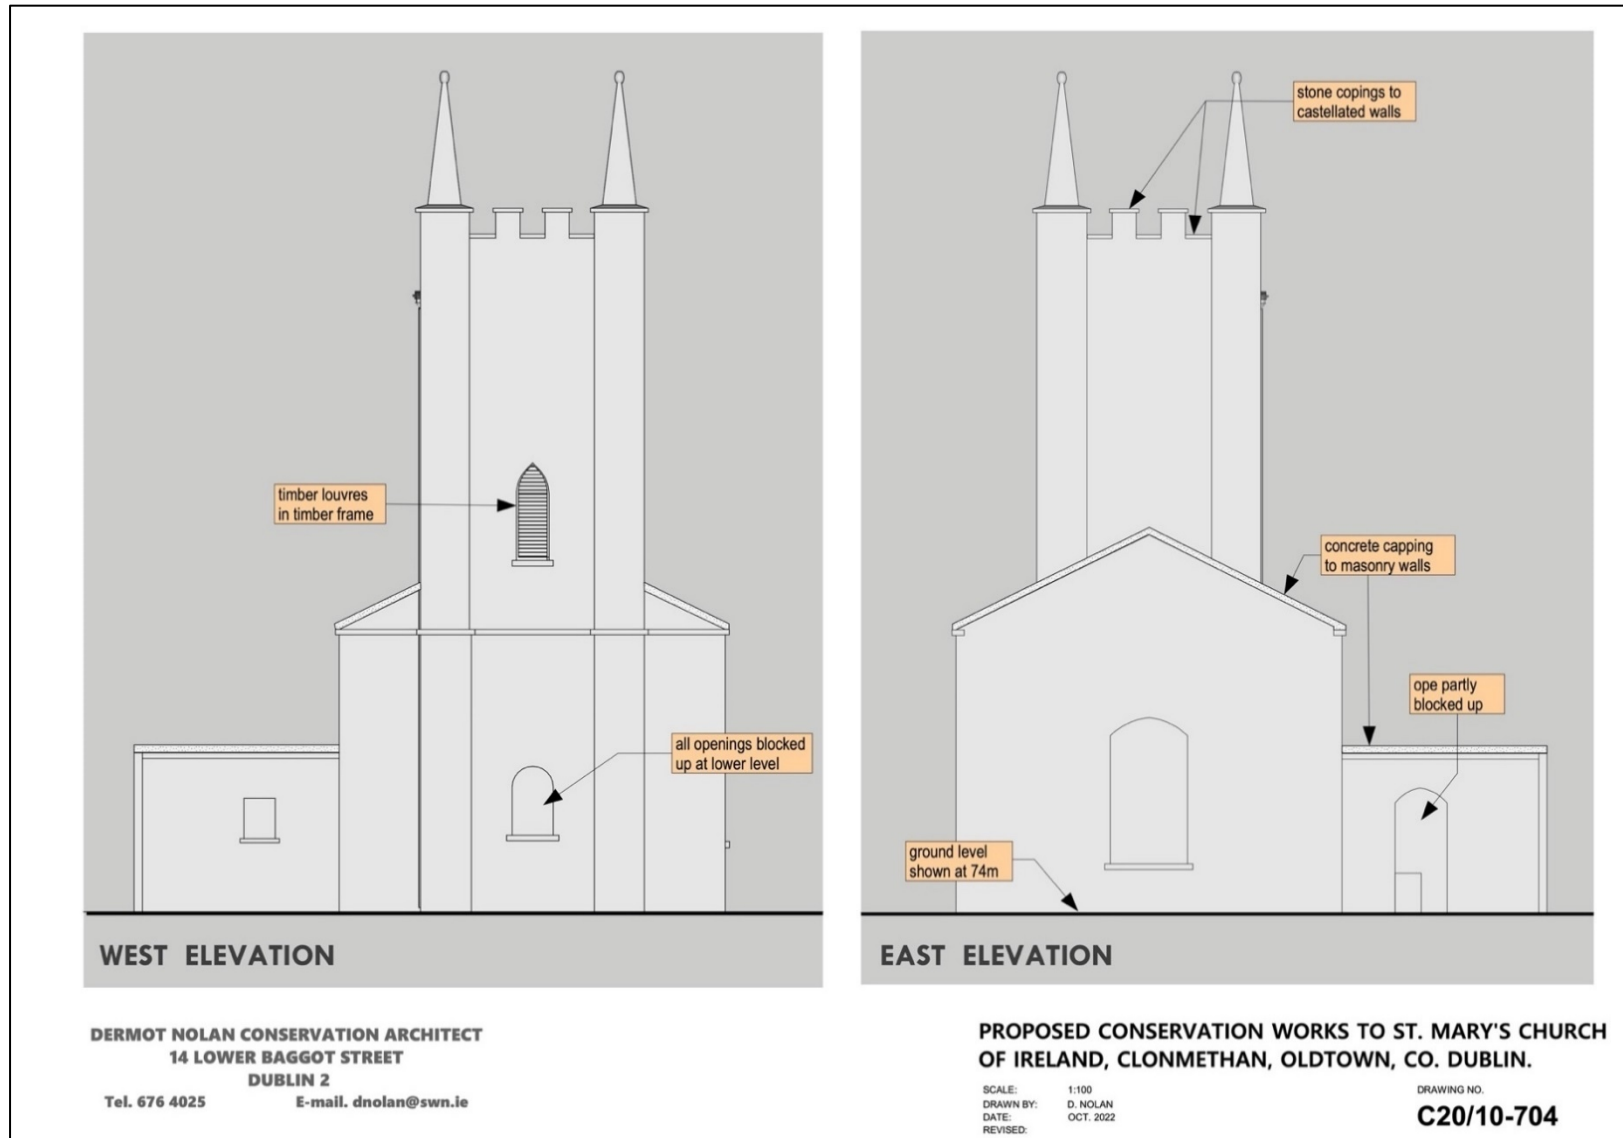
Condition of east and west elevations of St Mary's Church (drawing produced by Conservation Architect for the CMP).
